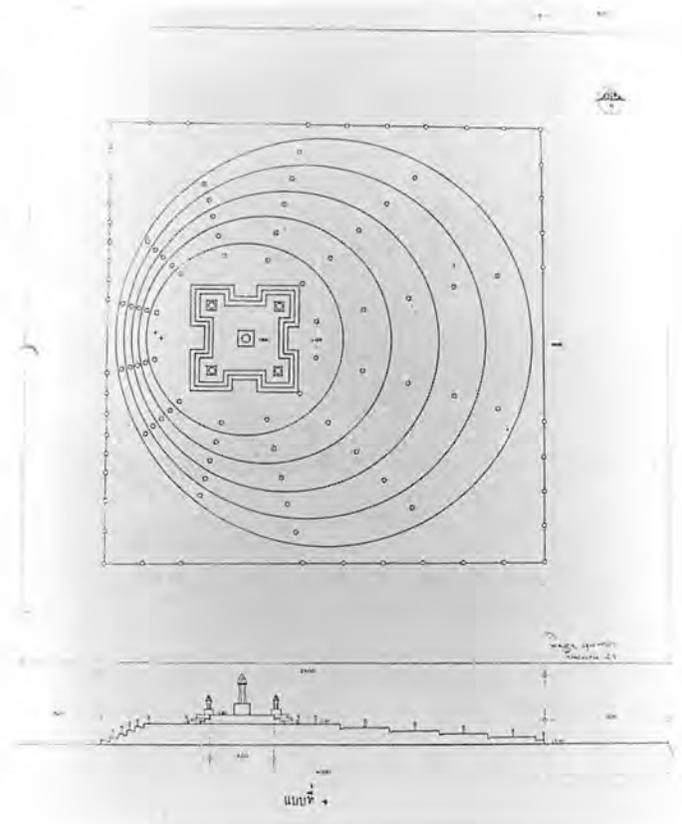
Ground plan and elevation of the site of the City Navel Pillar, Chiang Rāi, without the surrounding moat. Design: *Phithayā Bunnāk* พิศยา บุณนาค. 87/18/8
